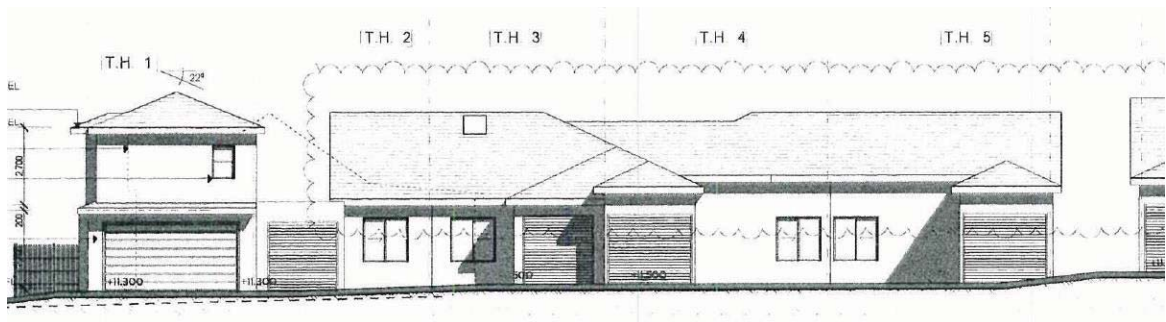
Southern elevation of development which faces onto the proposed driveway.
